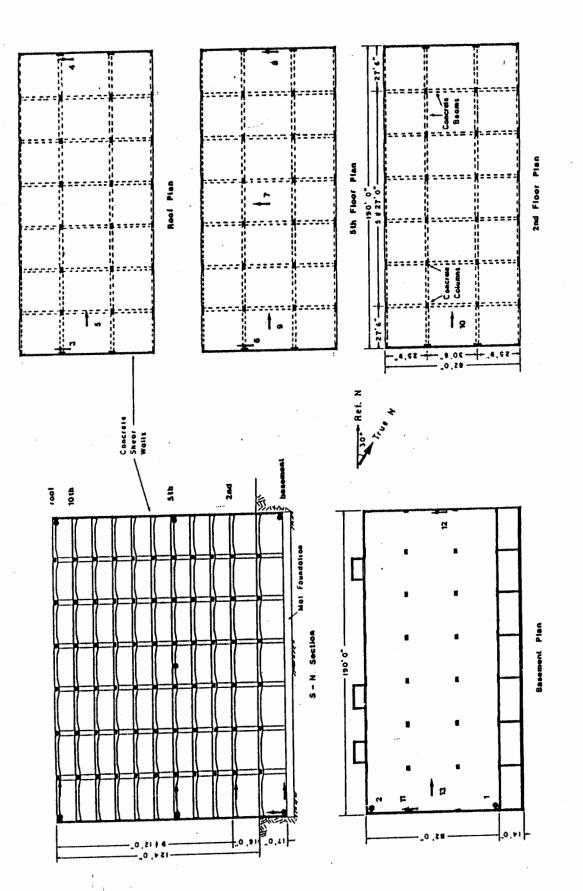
General Layout of Building CSMIP355 (Shakal, et al., 1989)
